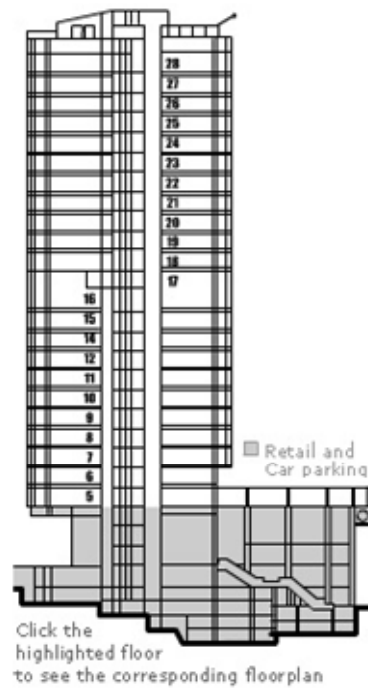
Majestic Building Elevation (www.majesticcentre.co.nz)
